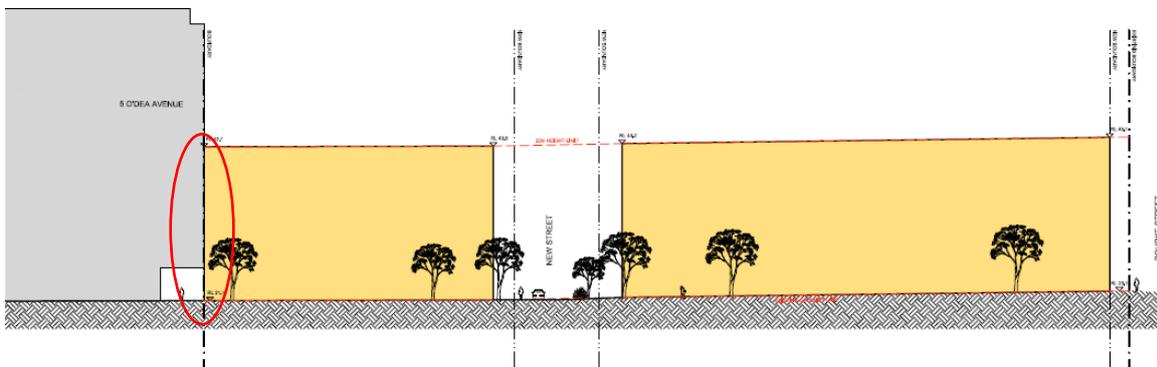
Location of the subject boundary between the subject site and 5 O'Dea Avenue
